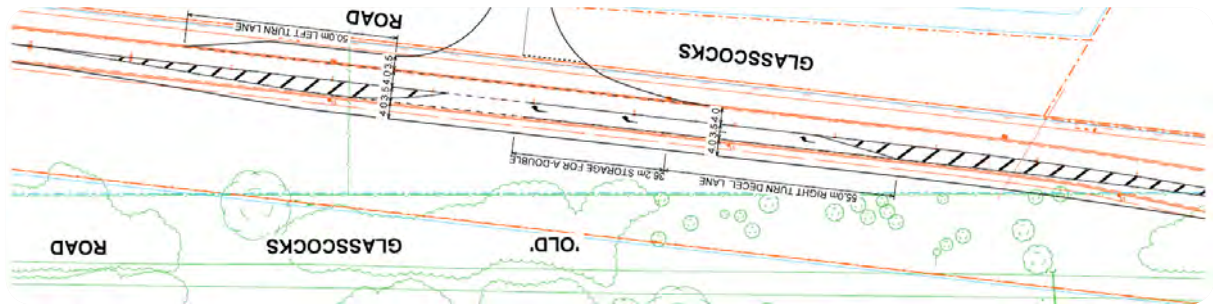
Concept Interim Intersection Design - Glasscocks Road / Site Access
